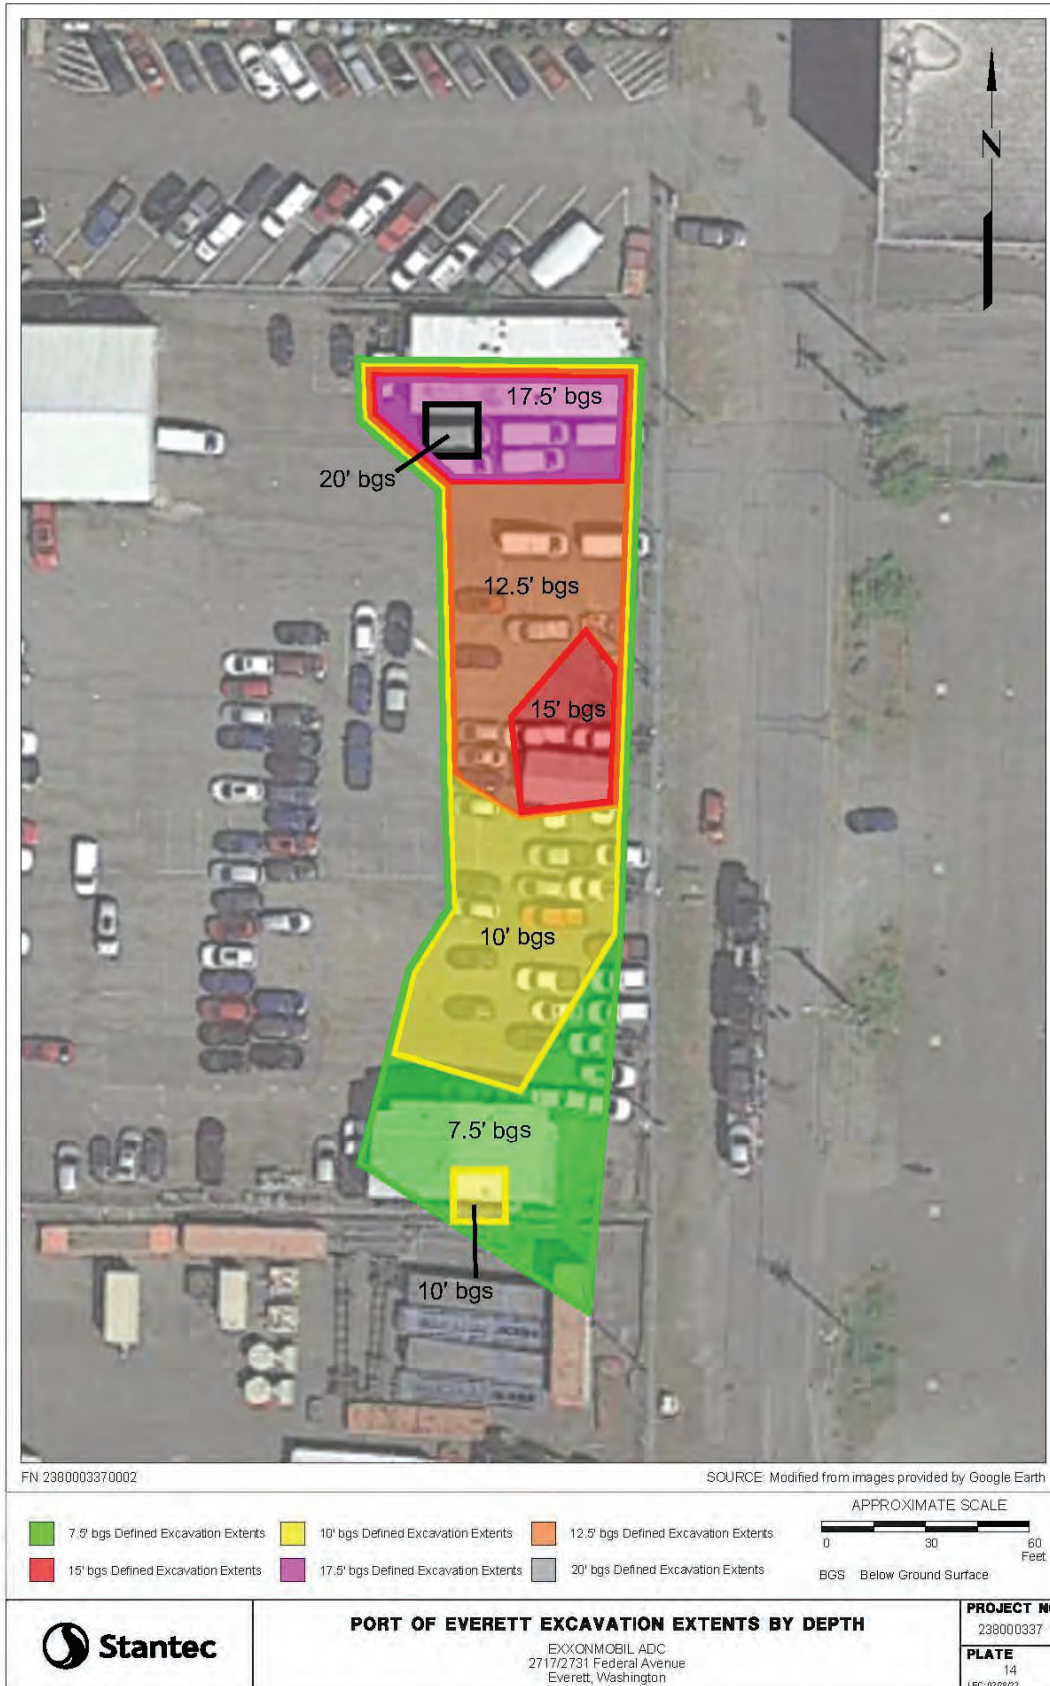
Proposed Excavation Extent on West Side of Federal Avenue
